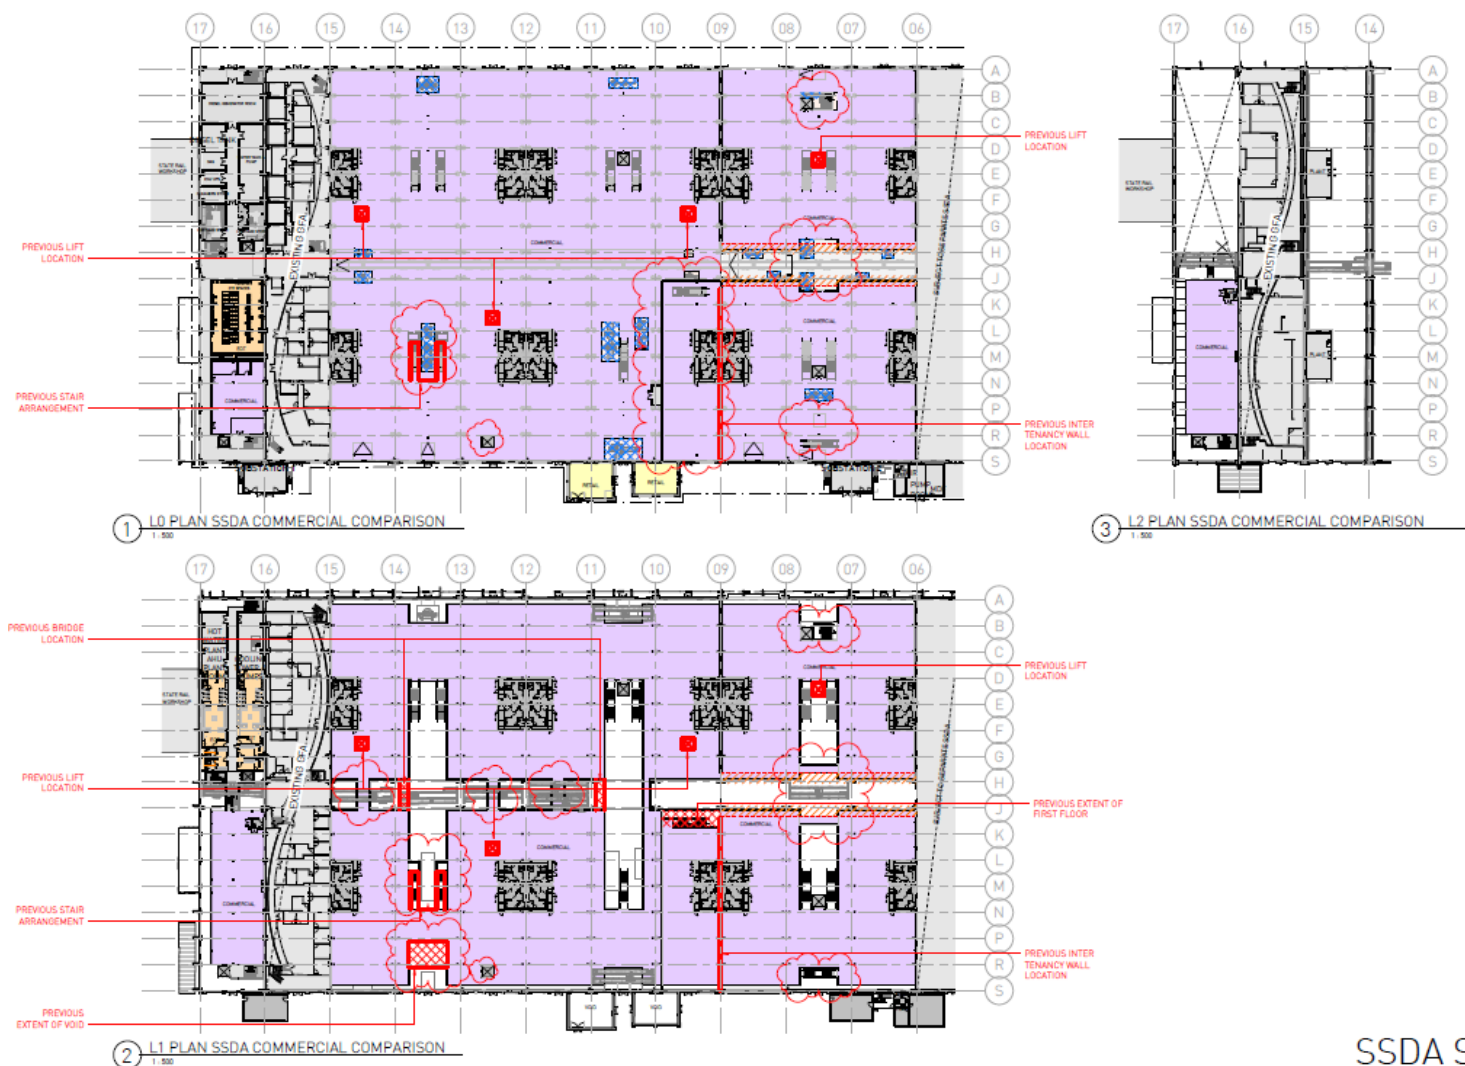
Bays 5-15 Second Floor Proposed Layout. Modifications in red. (Source: Sissons 2019)
